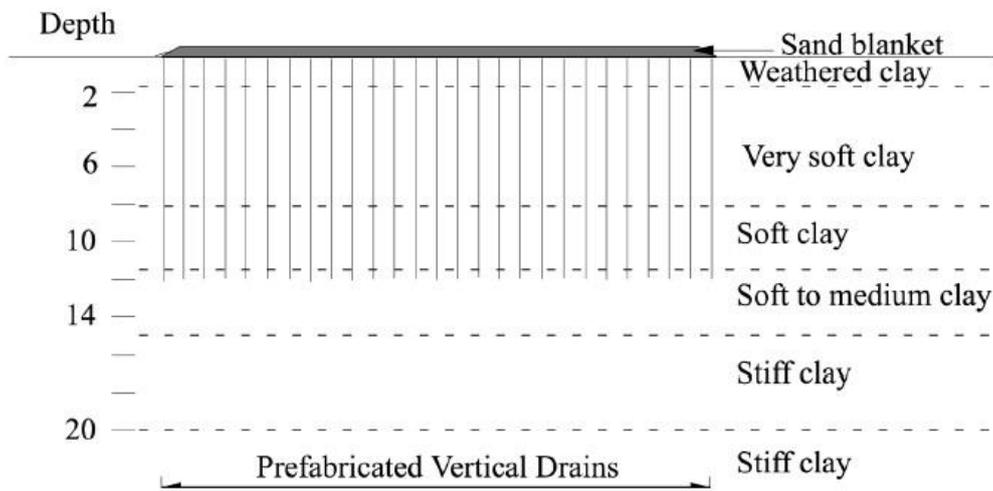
Cross section of an embankment with the subsoil profile, Second Bangkok International Airport, Thailand [30].
